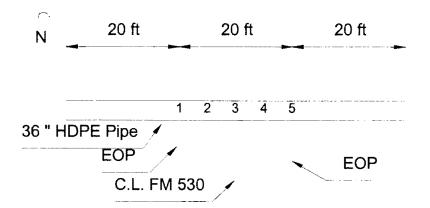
Plan View of Installation Y1 in Yoakum District
